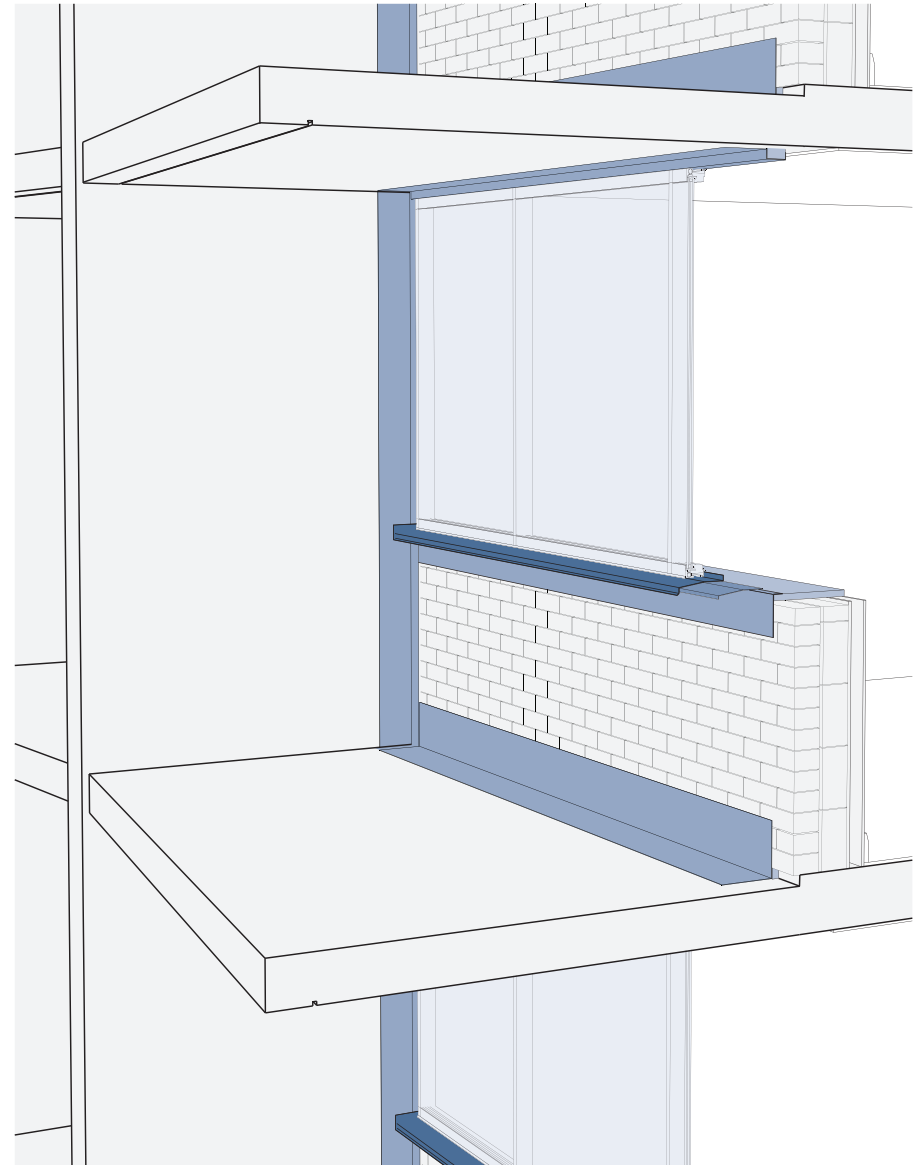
The replacement window is installed along with the end dam and subsill flashing. The removal and replacement of the window(s) must be scheduled so as to be completed in a single day to avoid exposure of the suite to the elements and minimize disturbance to the inhabitants. Interior finishing of the rough opening can be scheduled at a later time, ideally to be completed within a single visit at a convenient time.
